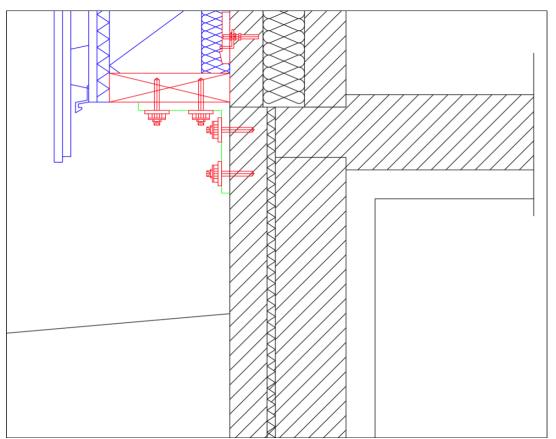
L-bracketing at lower part of the prefabricated facade that is fixed onto the existing building facade and carrying the Alingsås prefabricated facade element.
